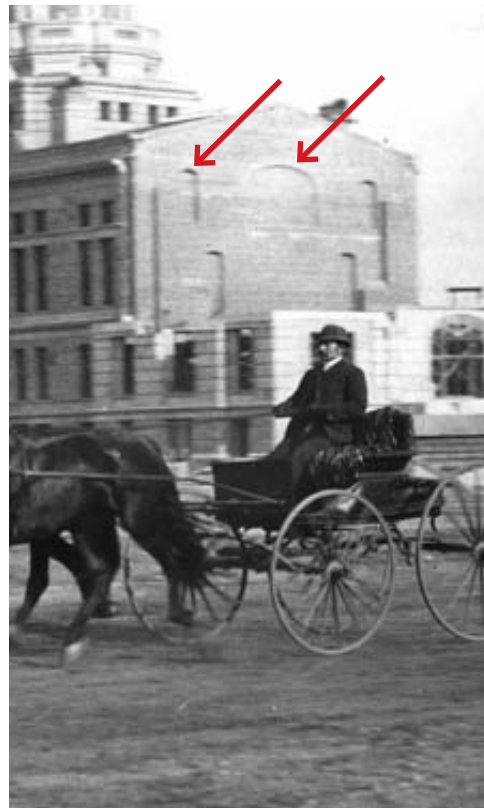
Phase II Construction Photograph, ca. 1889. Framed openings within the Phase I [1888] west end wall can be seen in the photograph, illustrating how the Phase I design and construction incorporated the openings required to connect the two construction phases.
